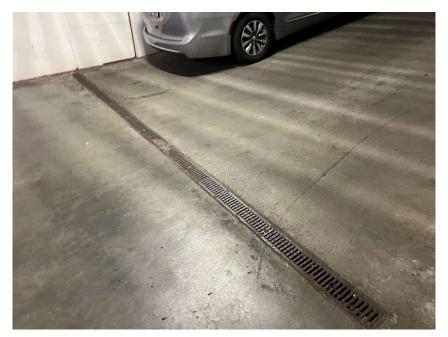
Example floor drain in the cellar level ventilated parking garage (04/06/2023)
